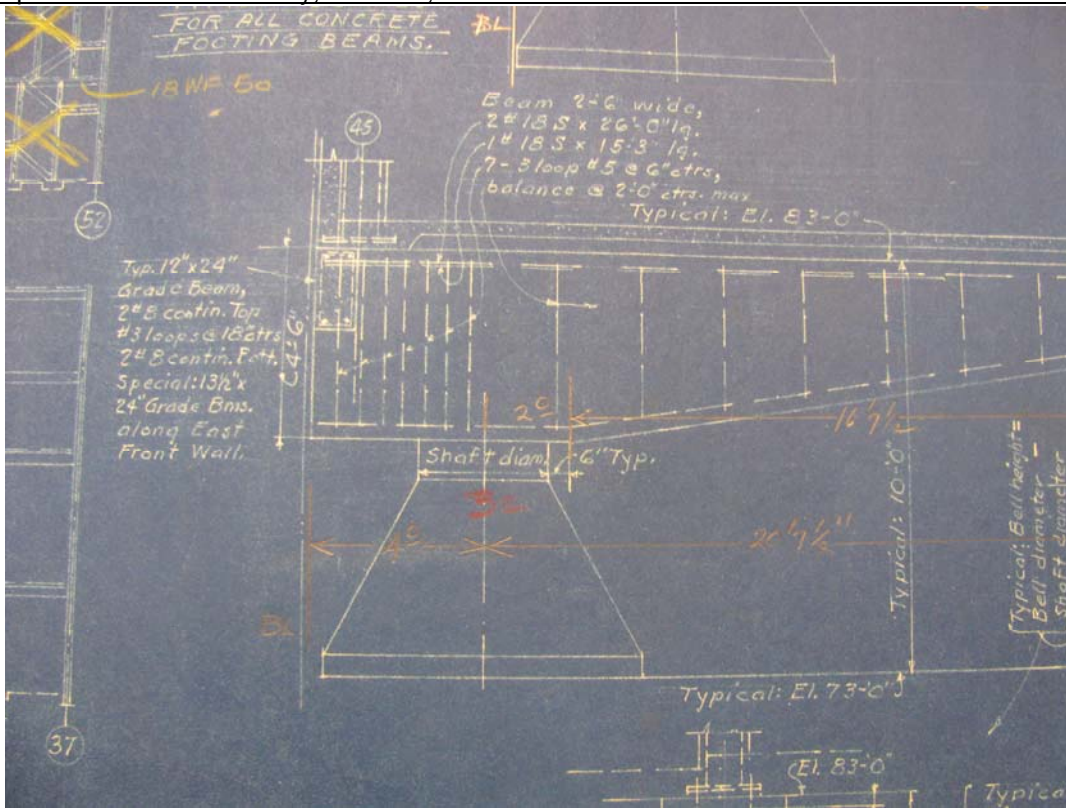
Concrete footing details (typical 10' to the bottom of shaft and 4'6" to the bottom of grade beams)
